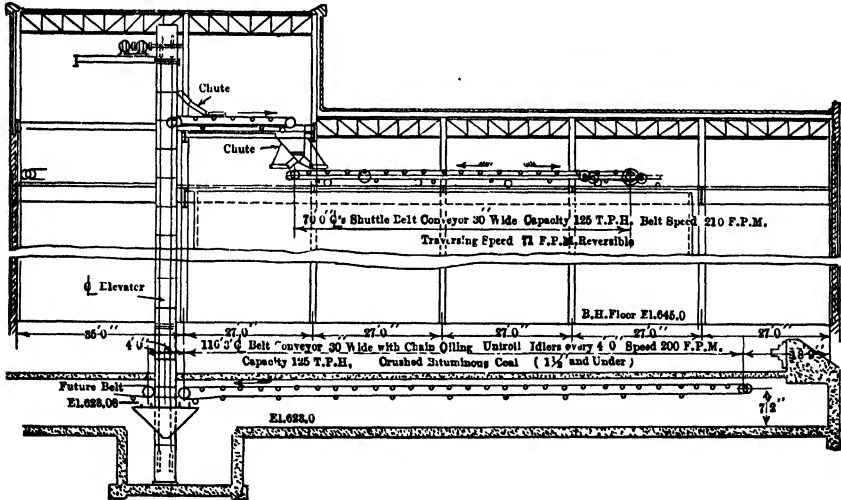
Long Boiler House Served by Shuttle Conveyor. (Link-Belt Company.)
